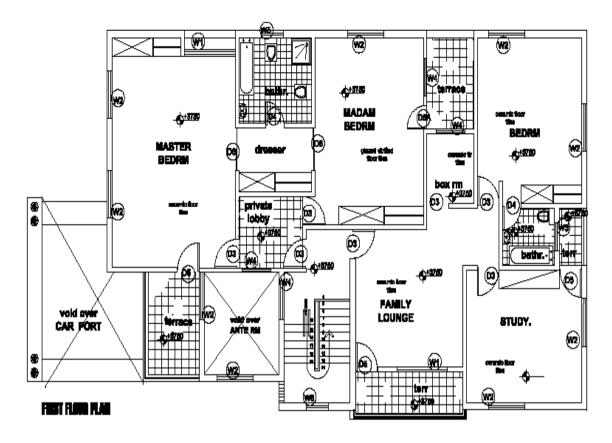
First Floor Plan of a Typical Detached Duplex Building
